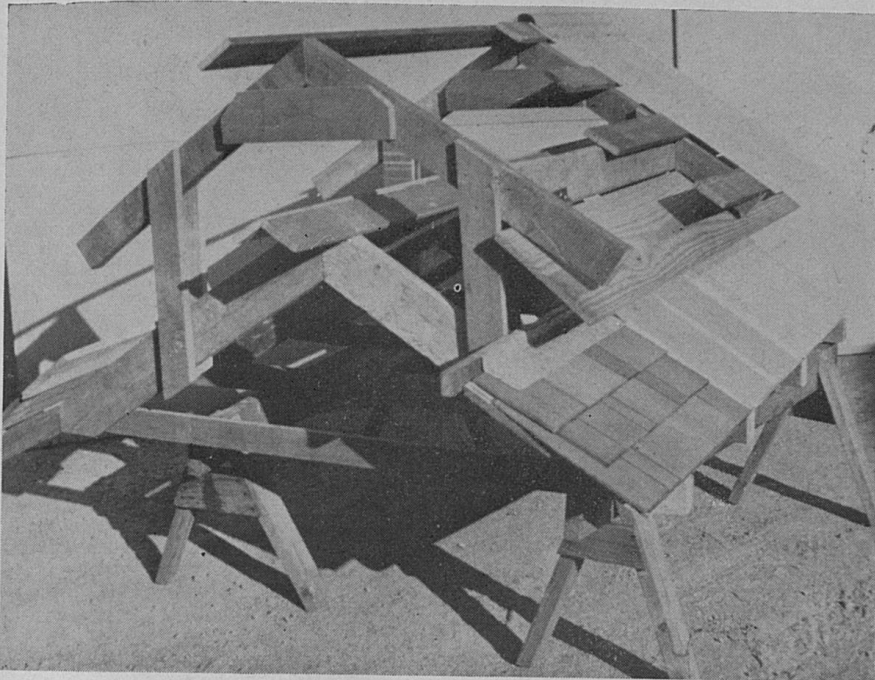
Model of ridge ventilator built according to Plan No. 2. Refer to Figure 12, page 16.
